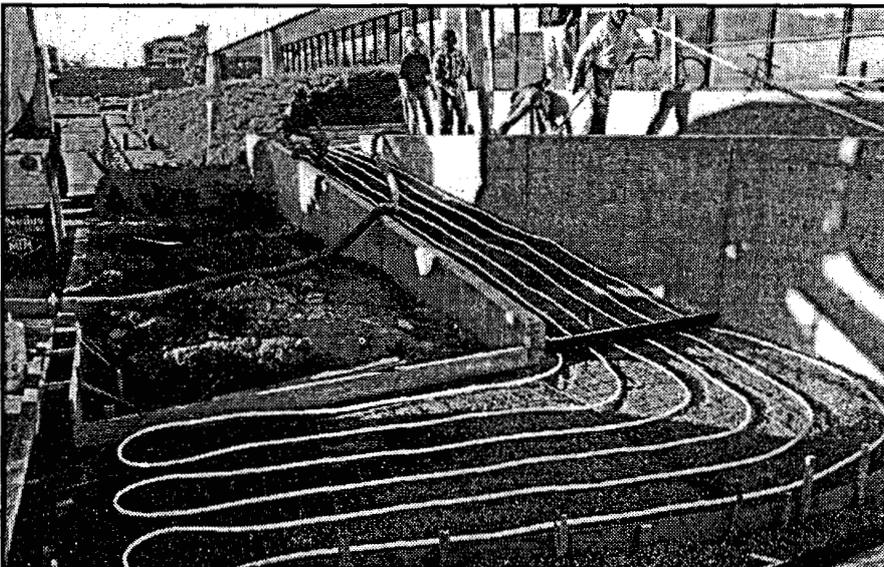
Concrete being poured for new geothermally heated wheelchair ramp on the OIT campus
